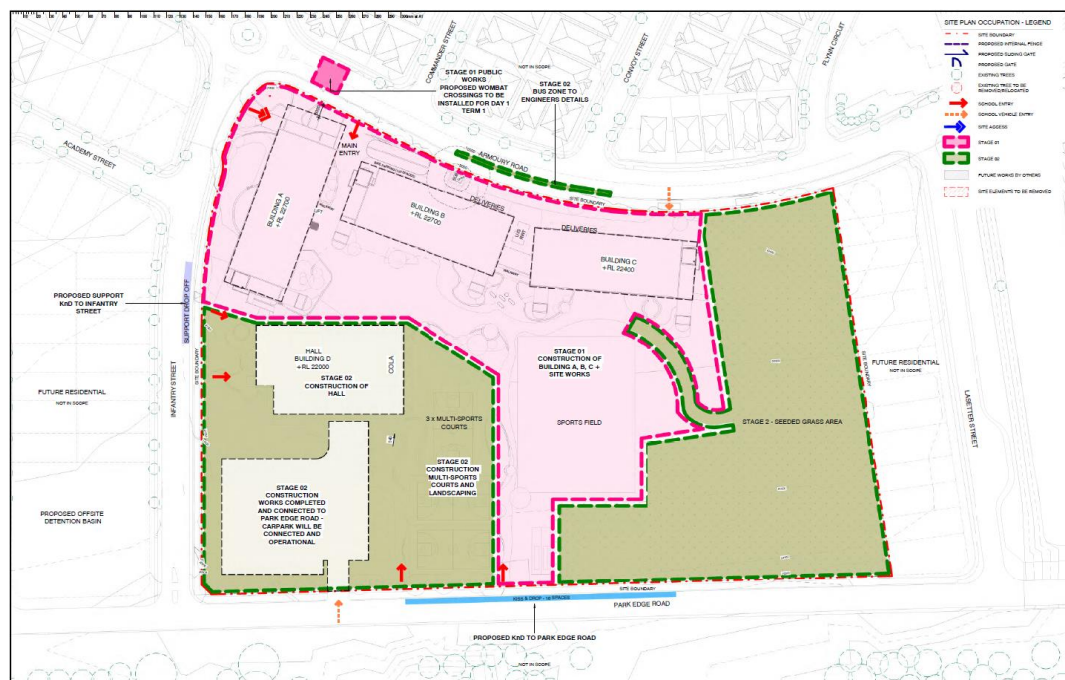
Stage 1 and Stage 2 with permanent works construction plan (Source DJRD)
